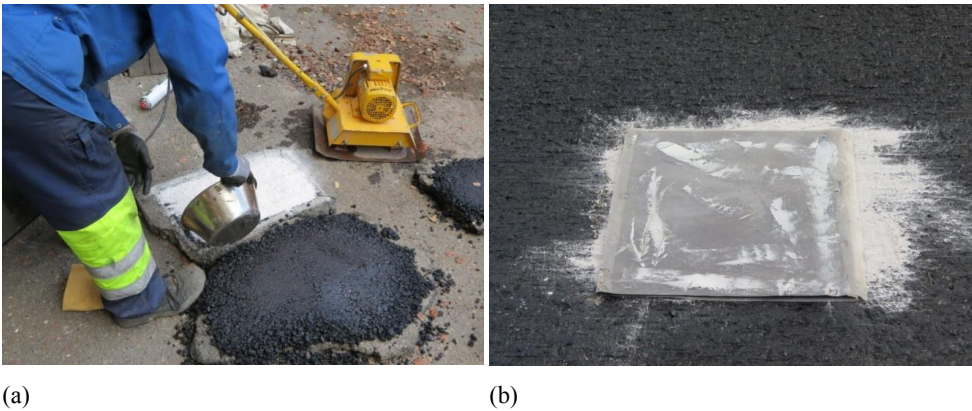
a) Trials with calcium oxide; b) Wood plate nailed to the pavement.
